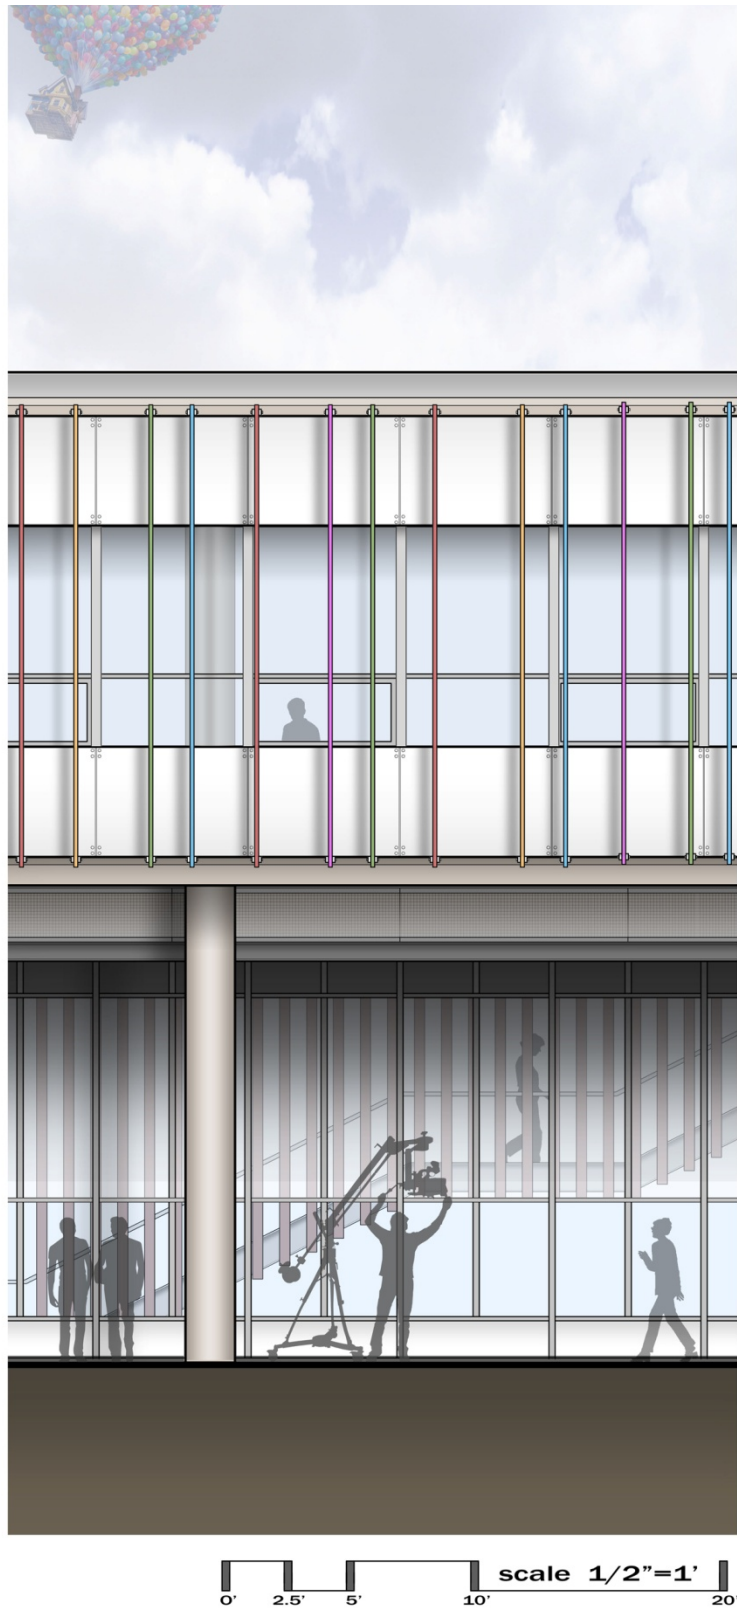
Mt. Royal/East Elevation Wall Section Partial Elevation
